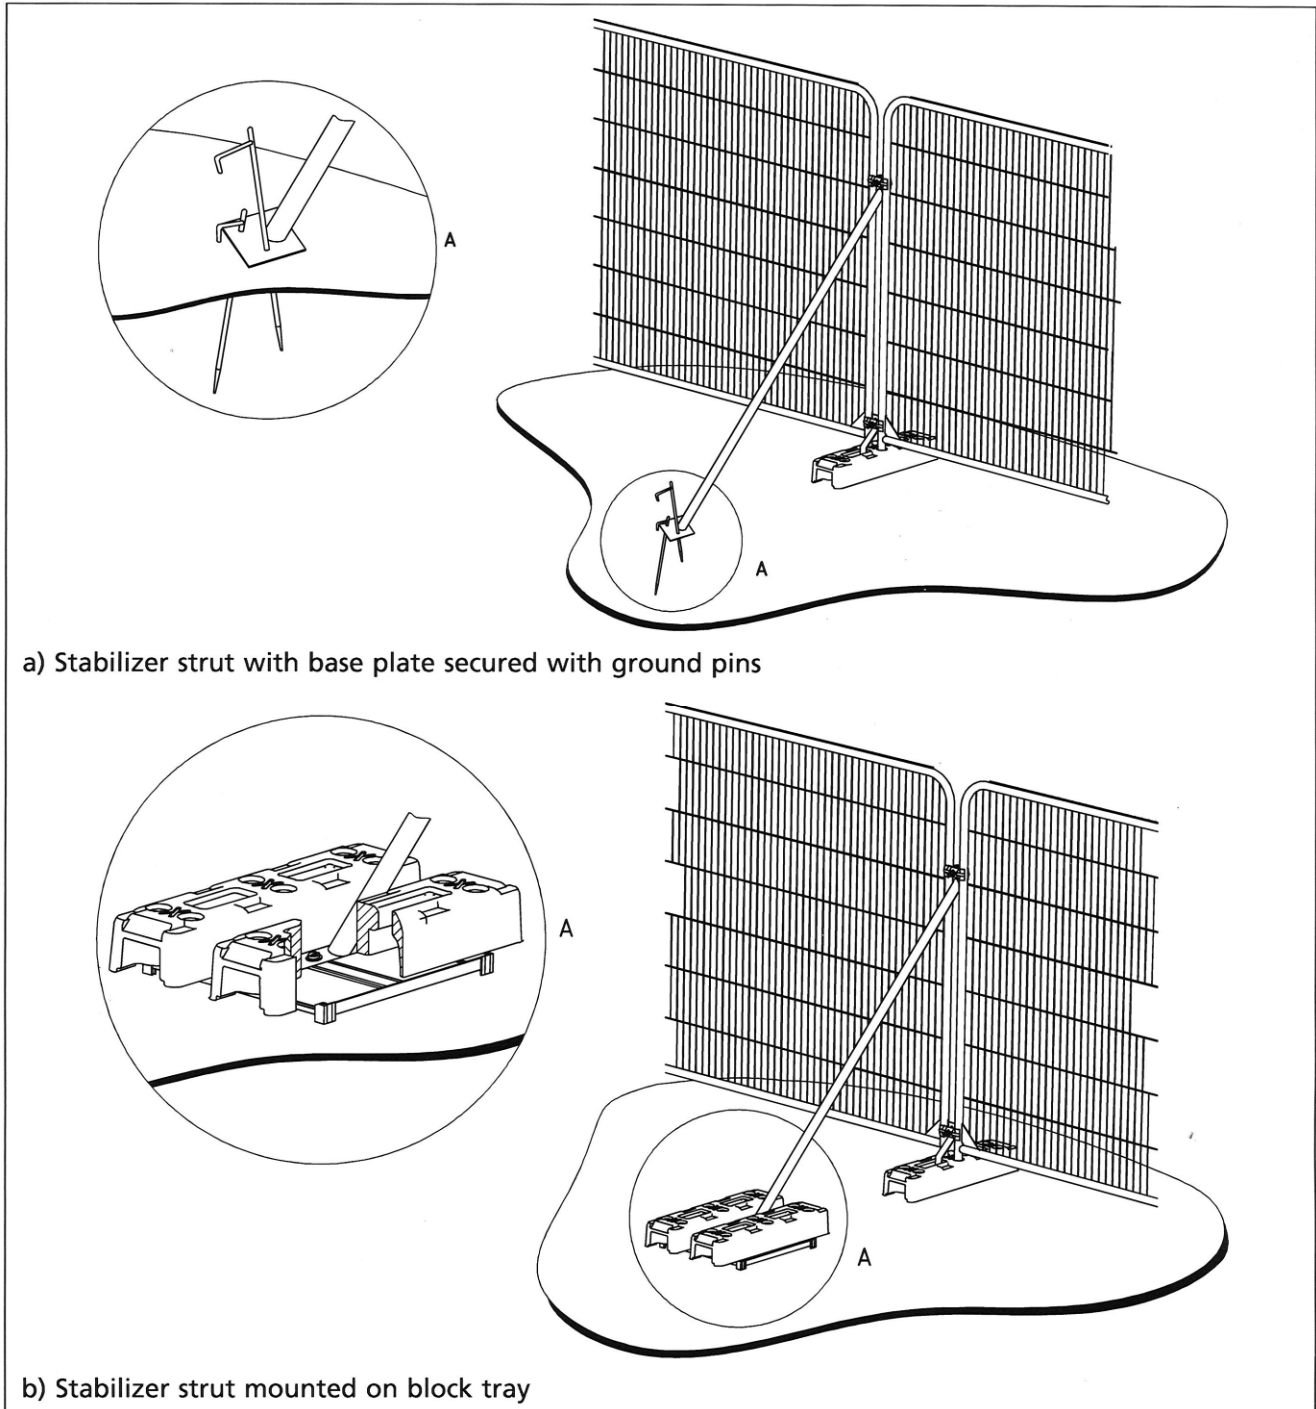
'Examples of above-ground stabilisation systems'. To be used where there is hard surfacing which is to be retained.
